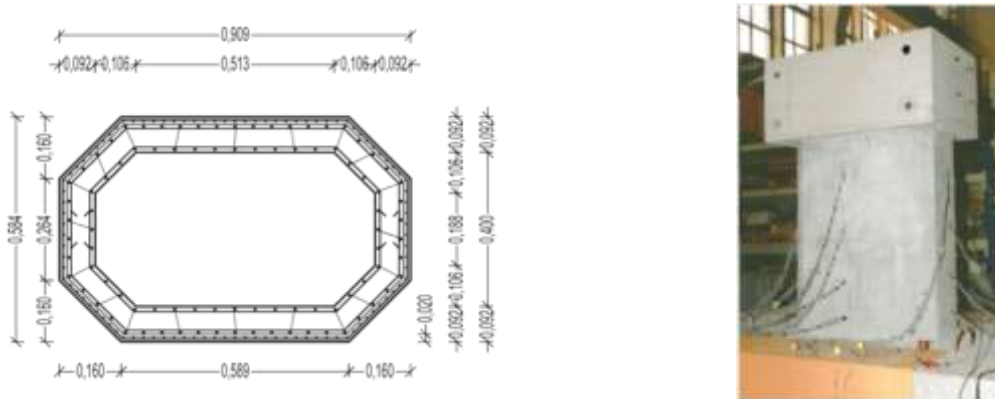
The 1:4 scale model of the column, strengthened using RC jacket
